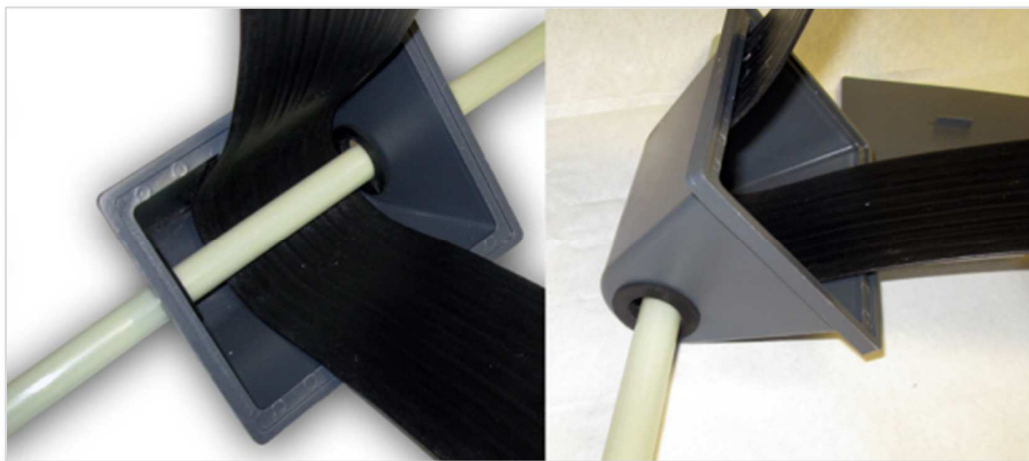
MacRes® MSE Wall System's Connection Assembly with Polymeric Anchor Rod.
